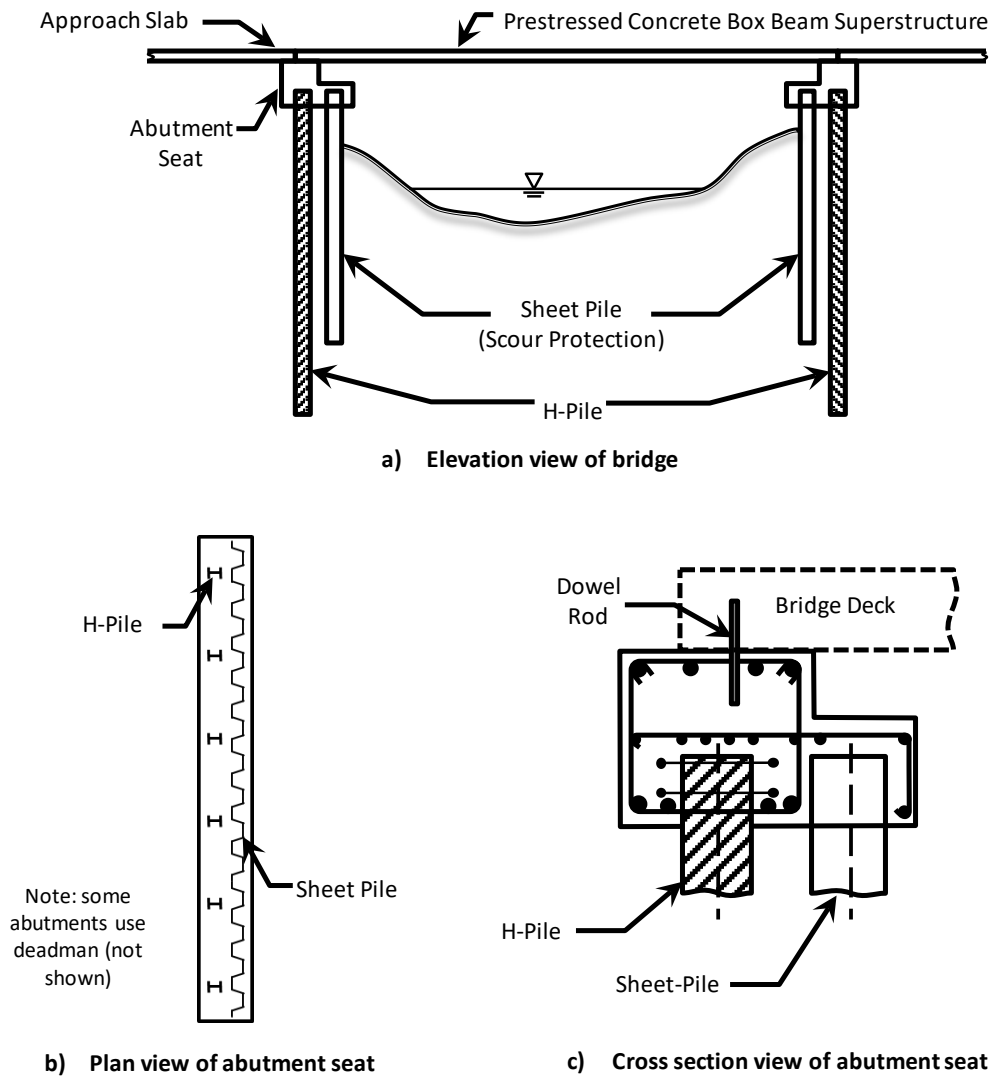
Schematic drawing showing typical NCDOT design for a short span bridge.
